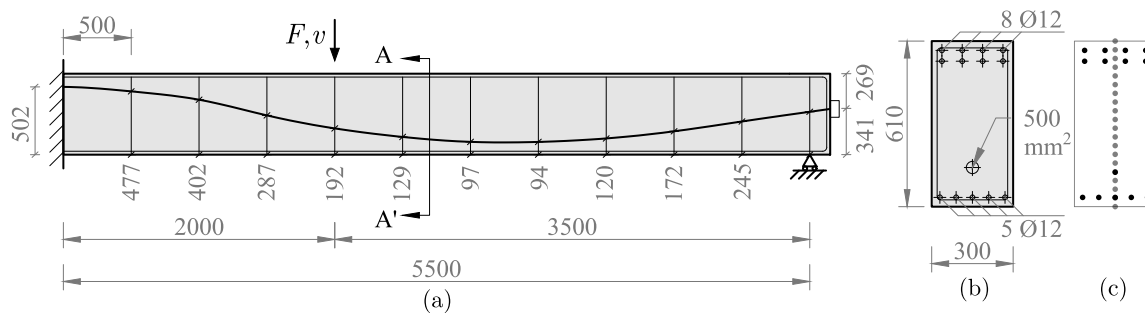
Geometry of the PC beam with a draped tendon: (a) longitudinal view; (b) cross-section A-A'; (c) fibers numerical discretization.
